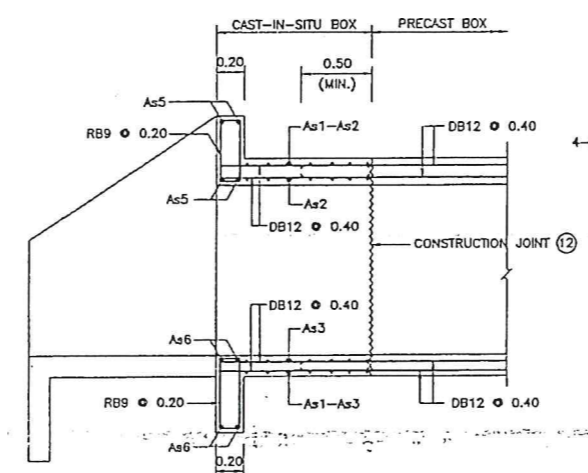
DETAILS FOR SKEW θ CAST-IN-SITU BOX
